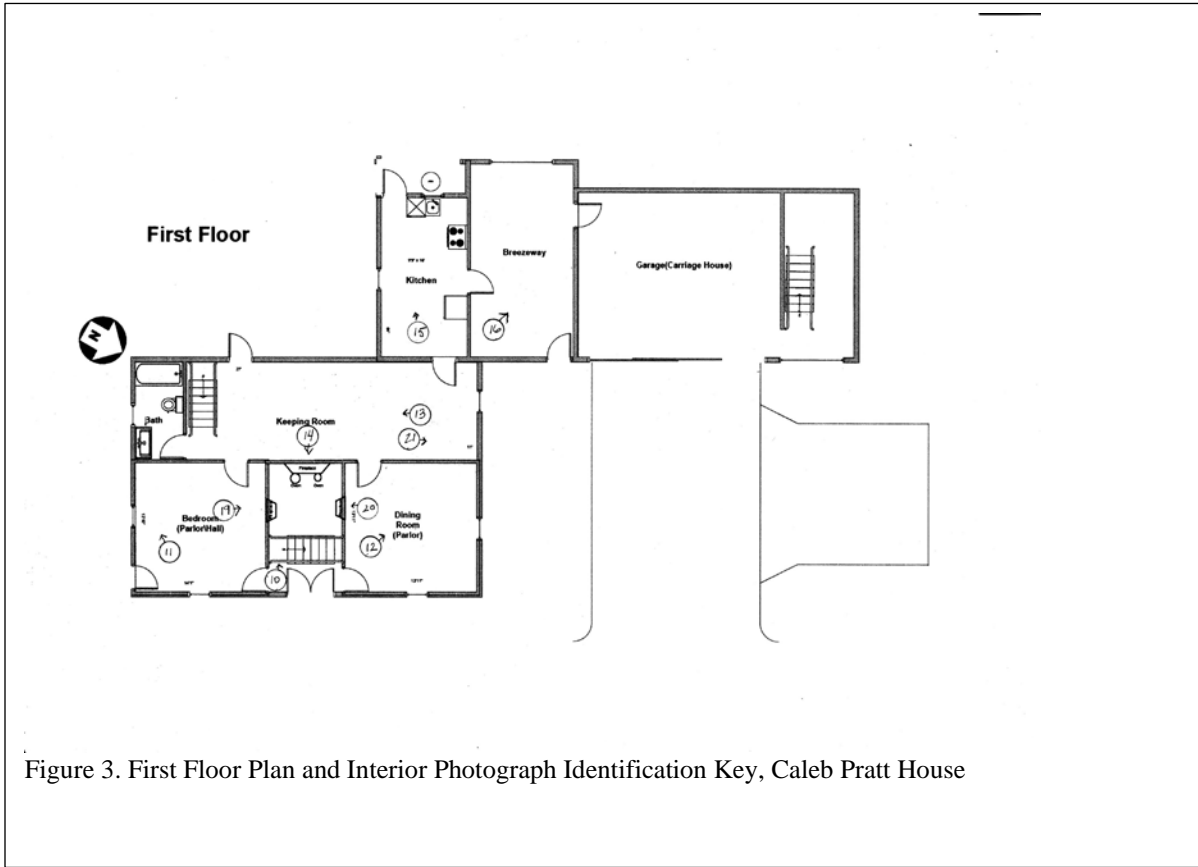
First Floor Plan and Interior Photograph Identification Key, Caleb Pratt House
